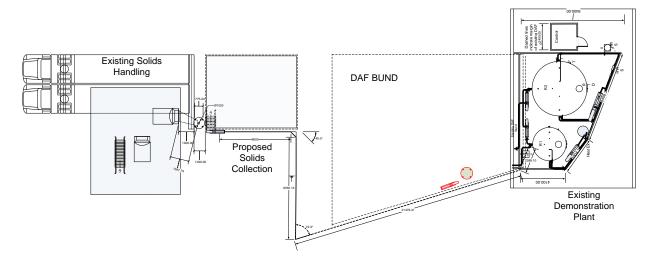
Layout of Solids Handling System within demonstration plant host site in 2011
